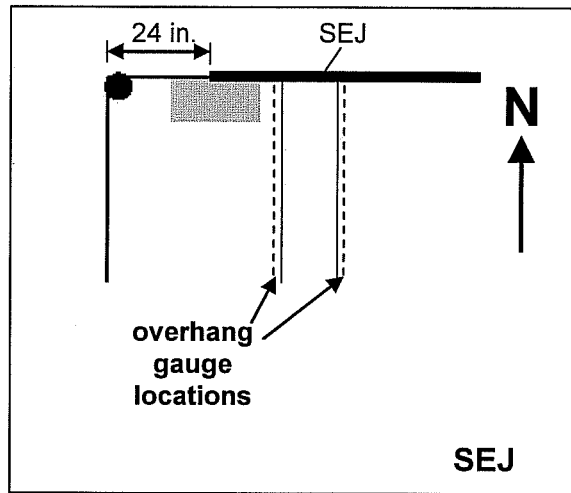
Overhang Test Area 3, SEJ and 6 in. top reinforcement spacing
